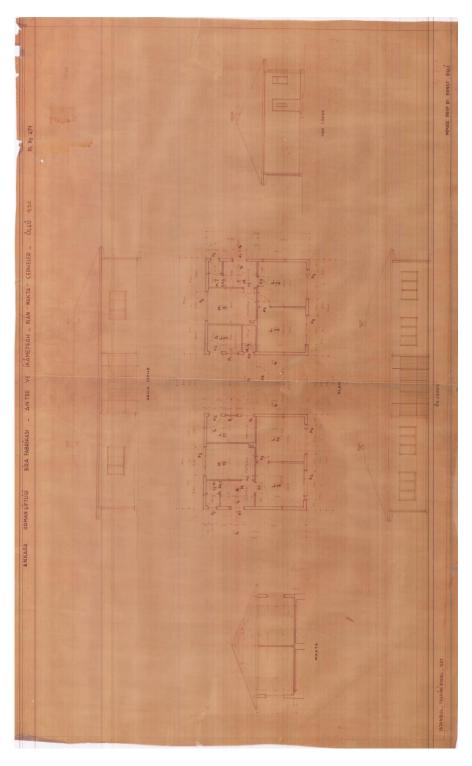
Drawing sheet of the entrance and dwelling building, Egli, 1937 (Source: TTA Archive)
